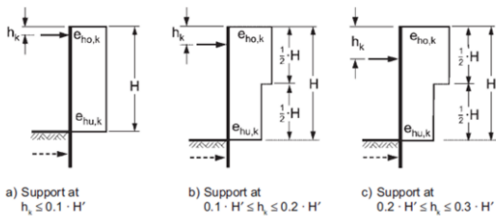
Pressure diagrams for single-supported sheet pile walls and in-situ concrete walls
